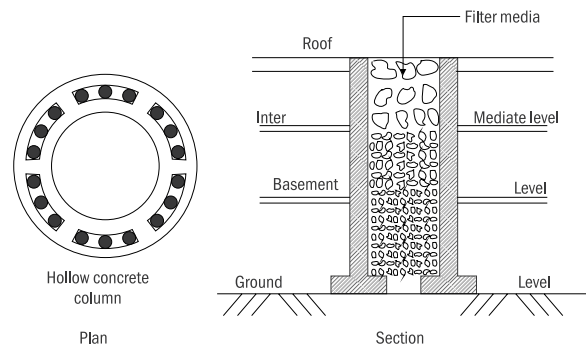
Hollow Column Facilitates Recharging Rainwater Directly Under the Inaccessible Building Footprint.
